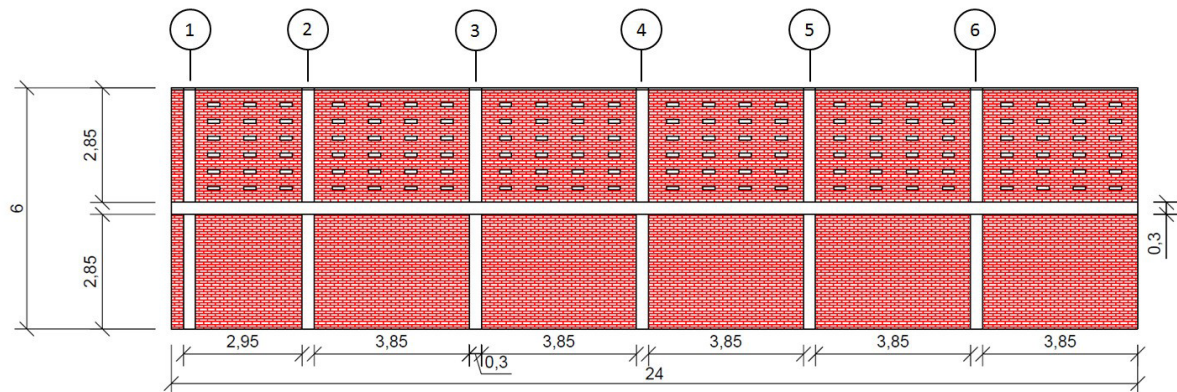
Wall geometry prior to collapse. Wall thickness is 14.6 cm, dimensions shown are in meters [1, 2].
